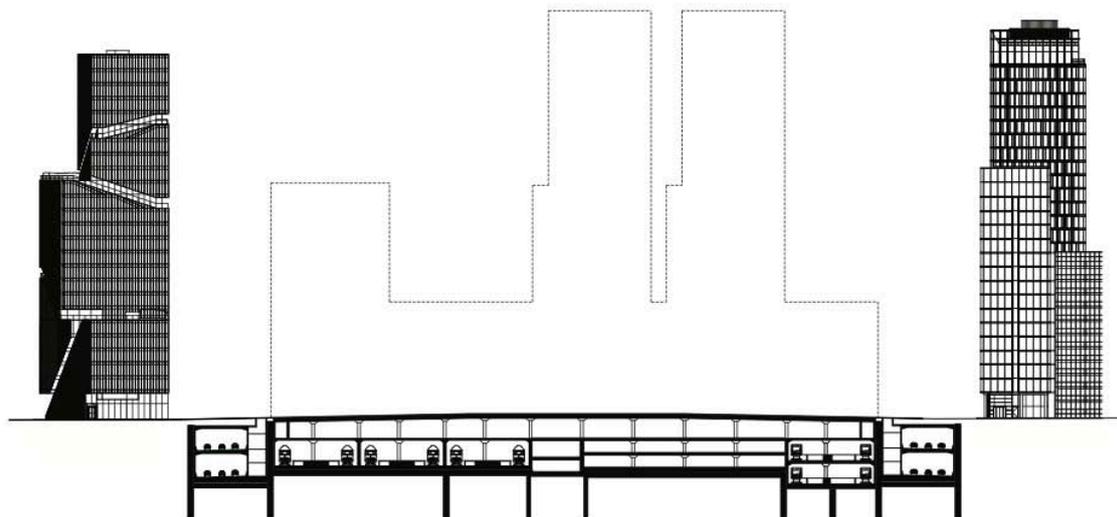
Impression of Zuidas 'Dok model' with train, tram, highway, and parking all underground and developed urban space above (Gemeente Amsterdam, 2009e)
